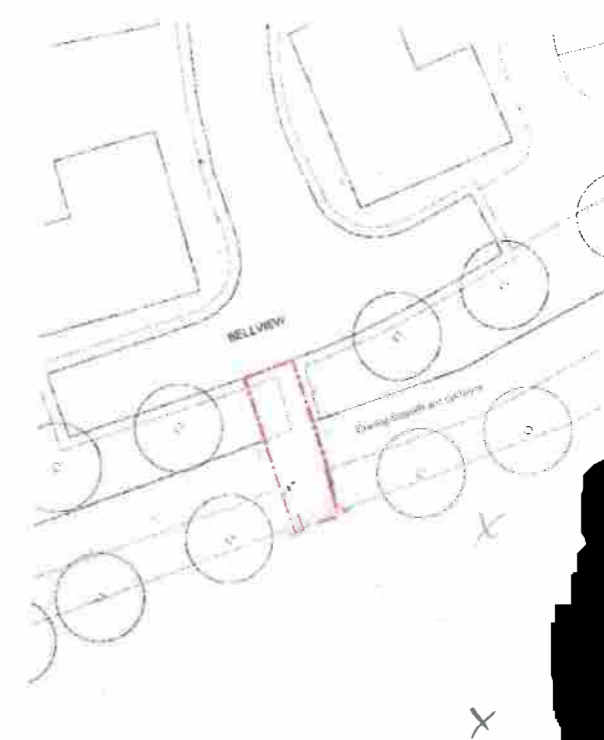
P3 Access Location Plan (adjusted by the County Council))
